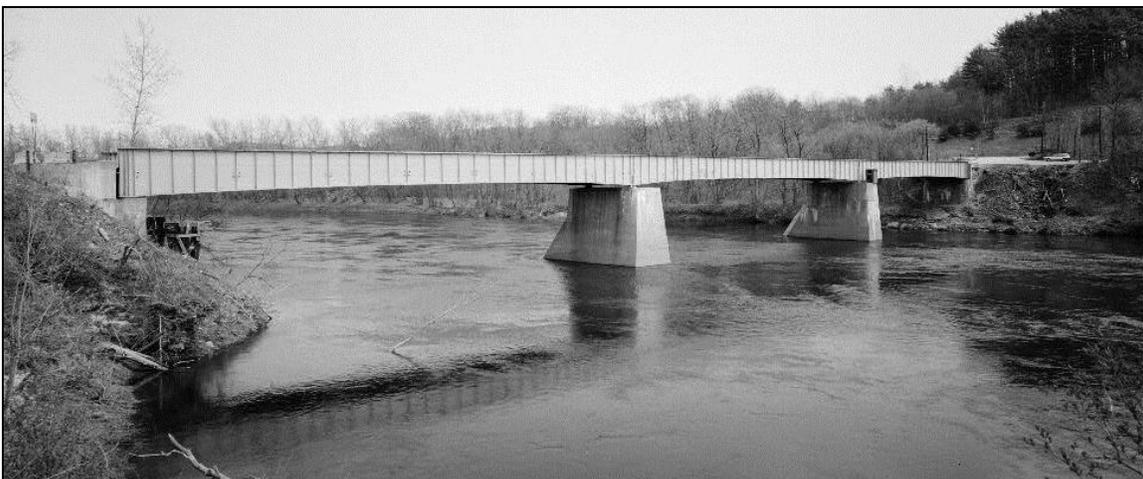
Walpole Village Bridge, steel girder built 1910, downstream side from Vermont (HAER 1988).
